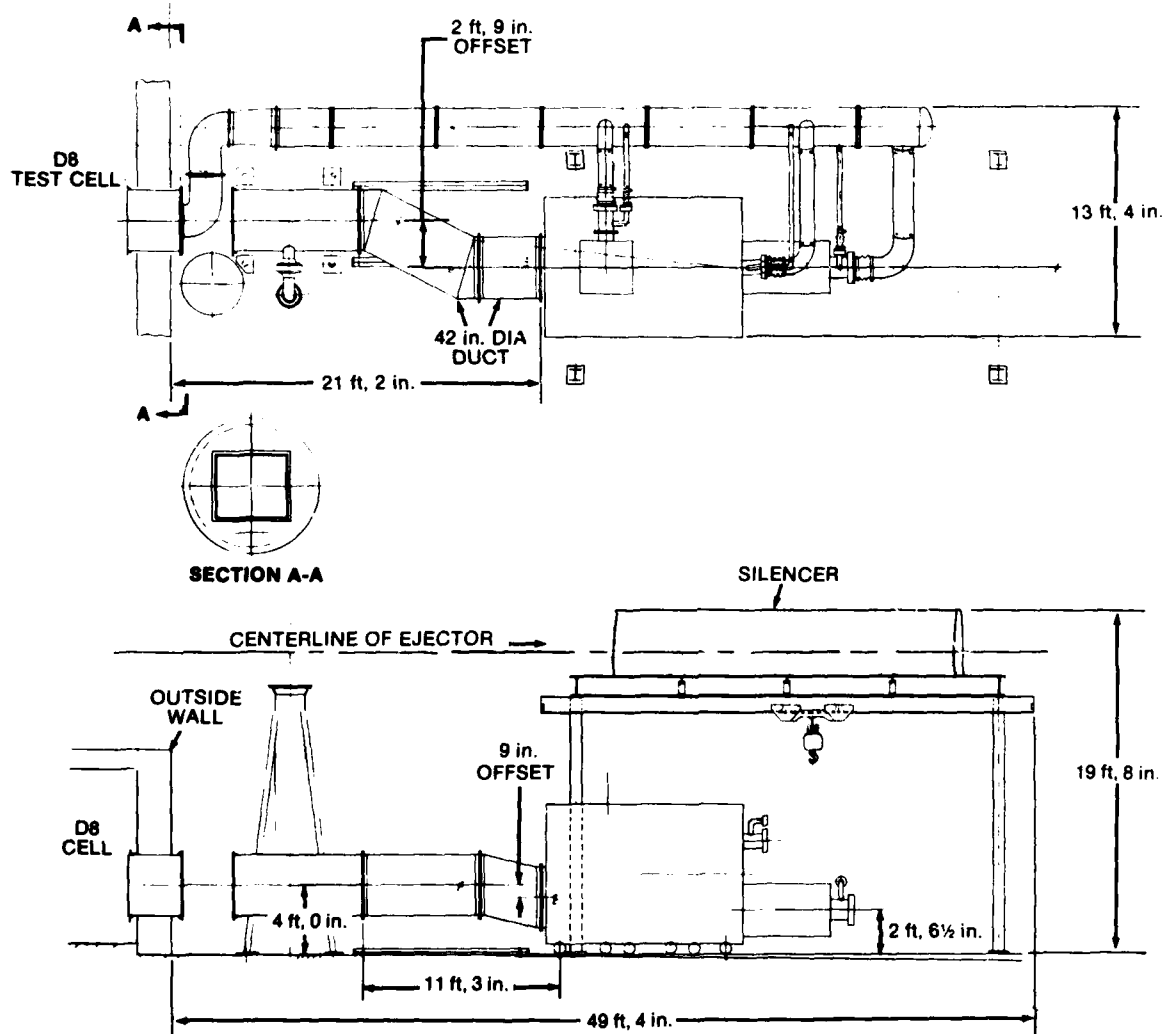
Area Arrangement of Altitude Facility and Test Equipment.
